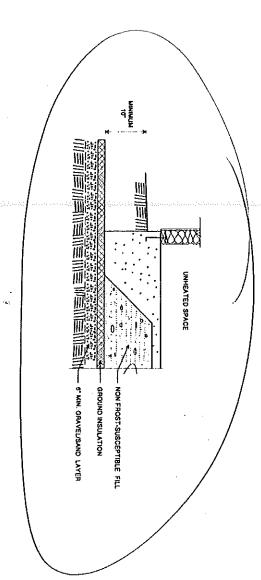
FPSF Design for Unheated Buildings with Insulation in Single Plane.
